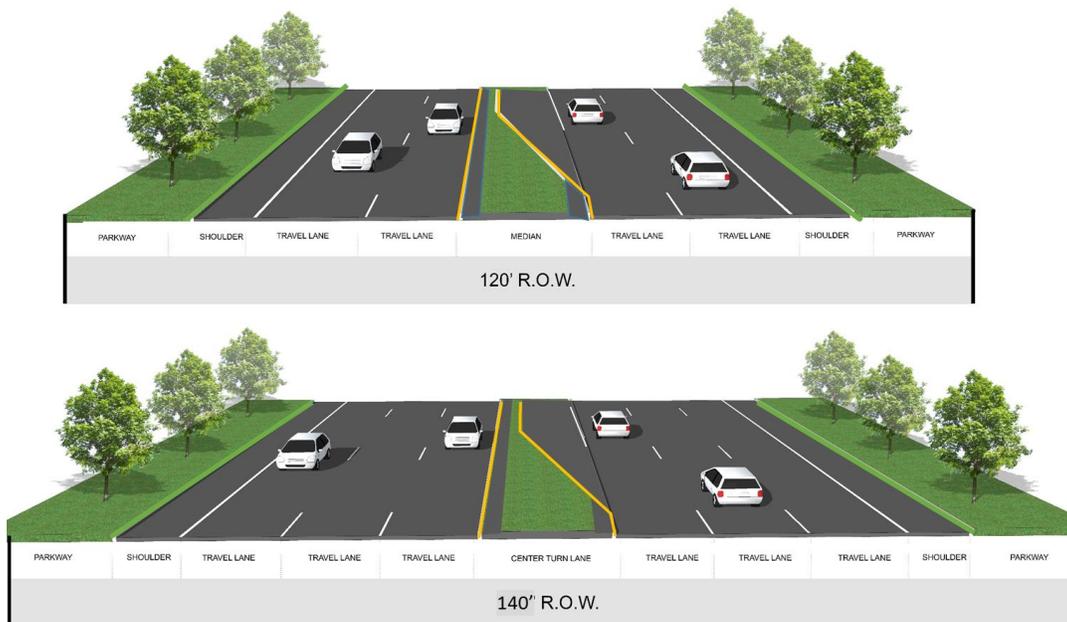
Typical Section of Urban Principal Arterial Roadways
